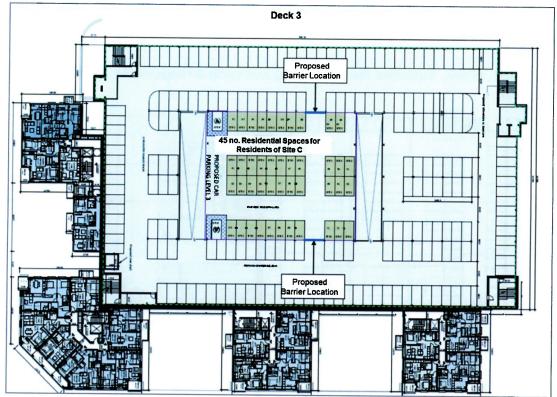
Proposed Multi-Storey Car Park Parking Provision (Deck 3)
